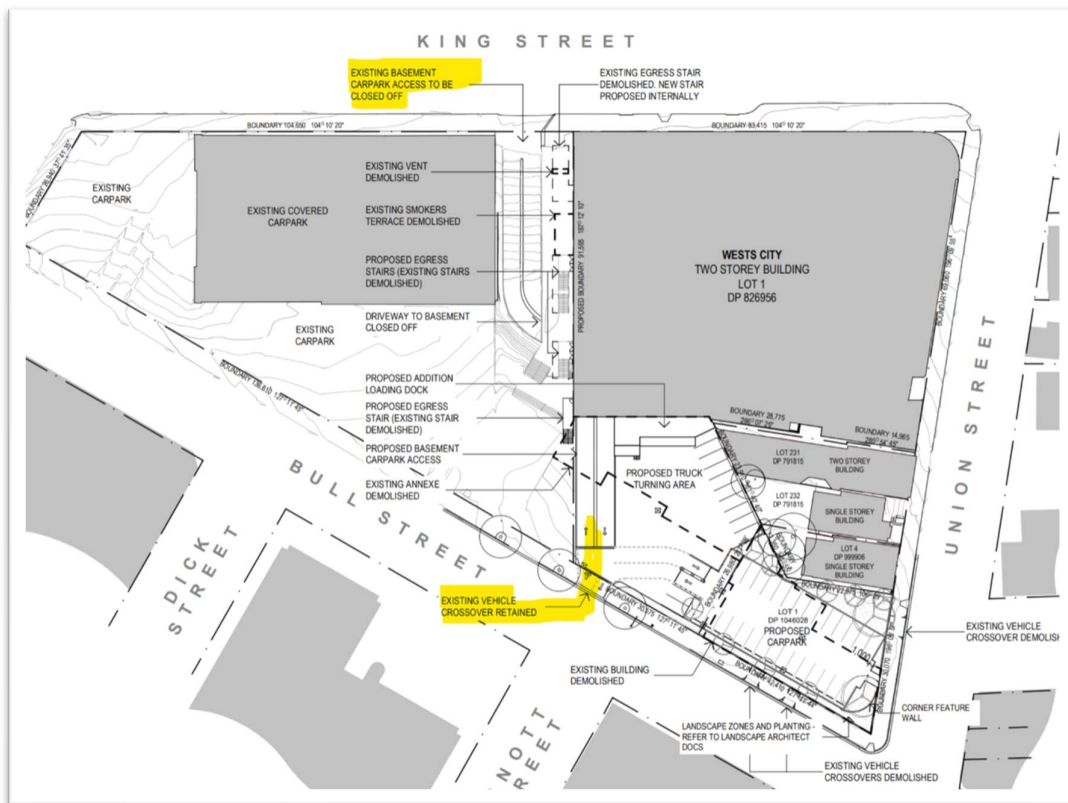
Site plan for Wests (NEX) subdivision and amended access DA2019/01171 – access highlighted
